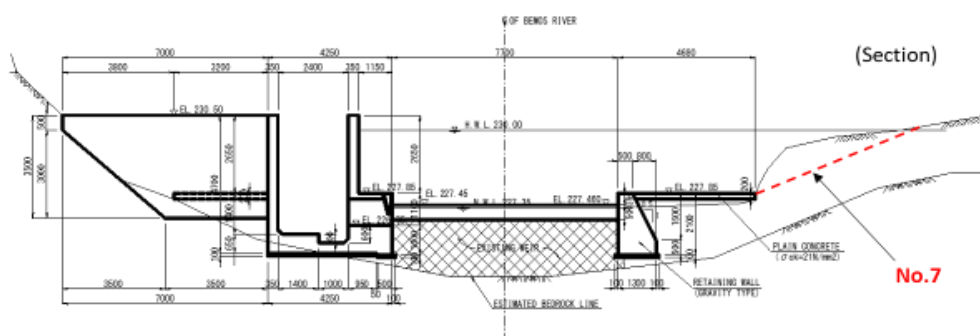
Rehabilitation Plan from No.7 to No.8
